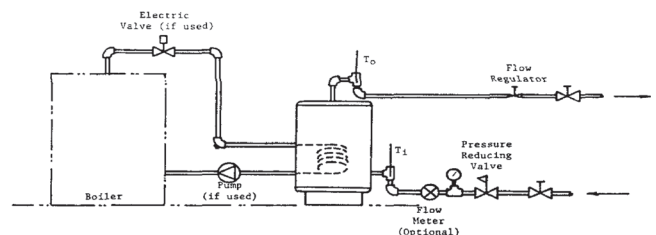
Type I appliances—typical piping arrangement, integrated heater, domestic water in external tank.
